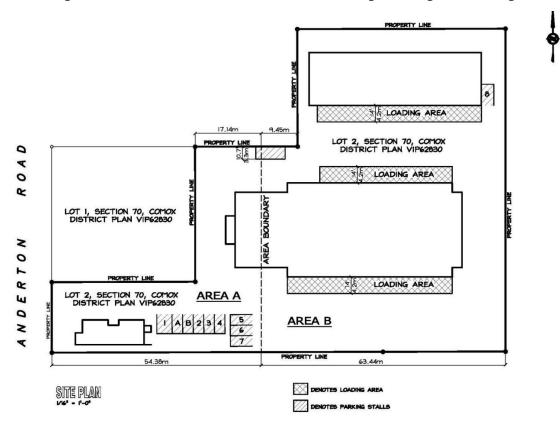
640 Anderton Commercial/Mini Storage Parking and Loading
